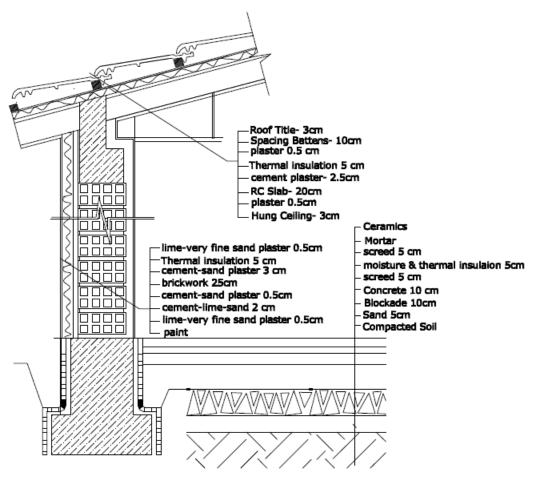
Construction Technique in Contemporary period- Brick wall - C_6
